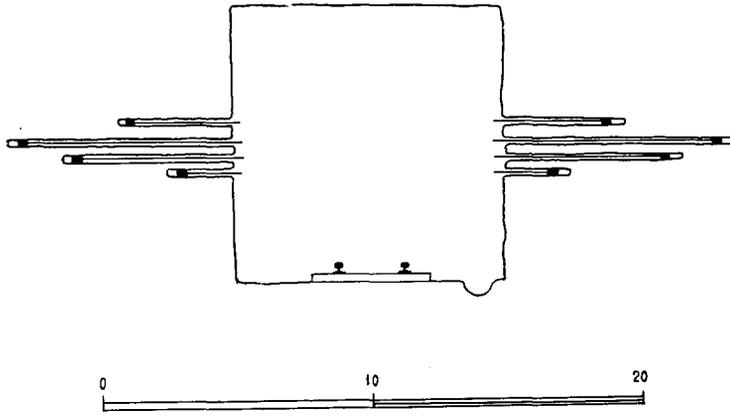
General arrangement of measuring pins in a haulage sidewall
